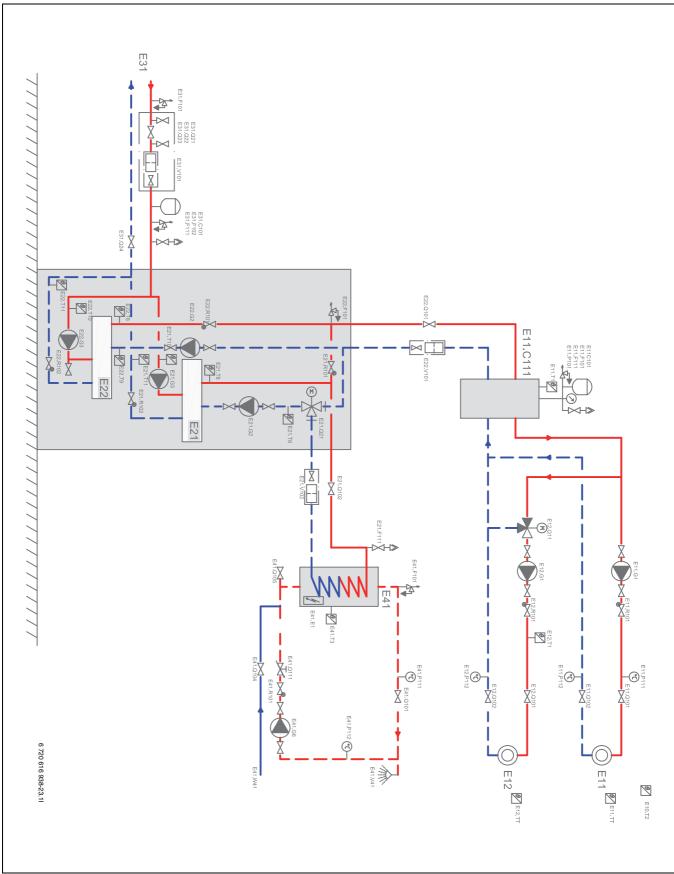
Heating circuit and buffer tank without additional heat (→ Chapter 8.2.1, 8.3)
